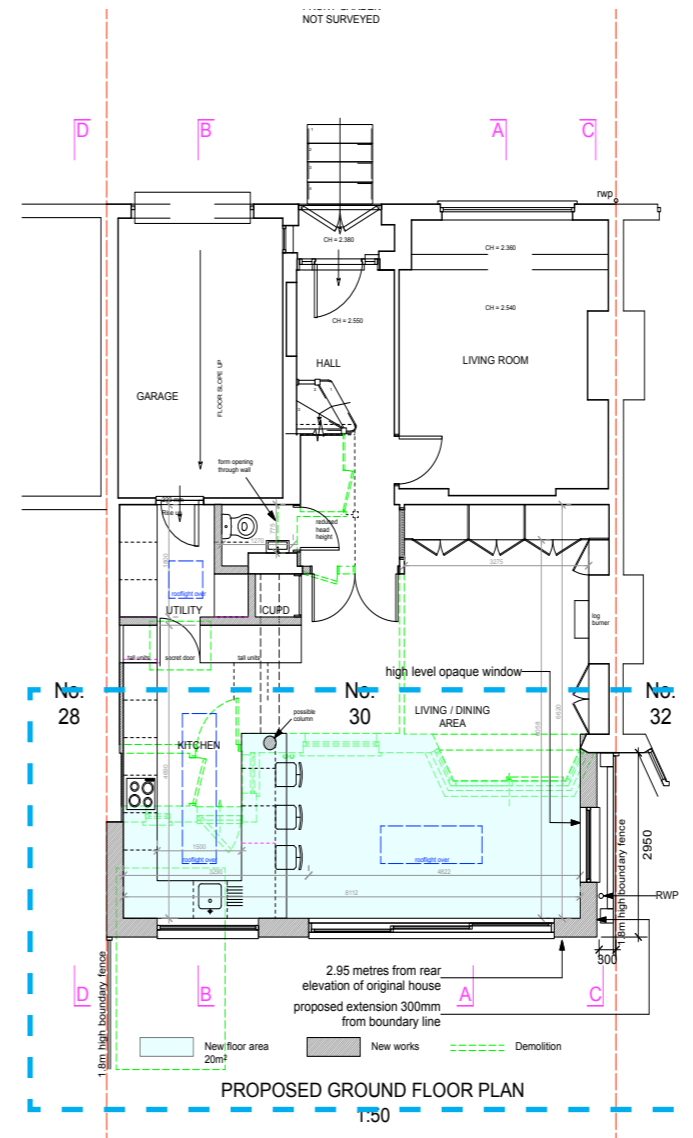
Approved Ground Floor Rear Extension to No. 30 Abbots Gardens (19/0583/HSE)
